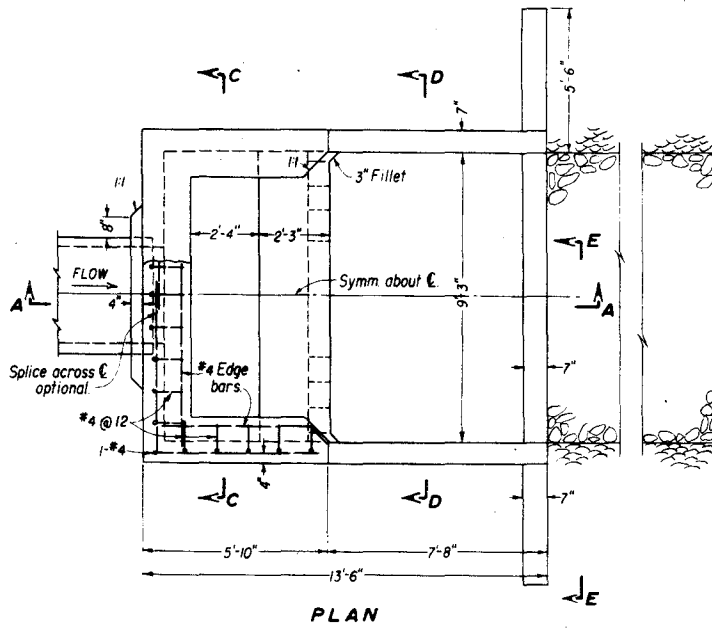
Type 5 baffled outlet. 103-D-1344
